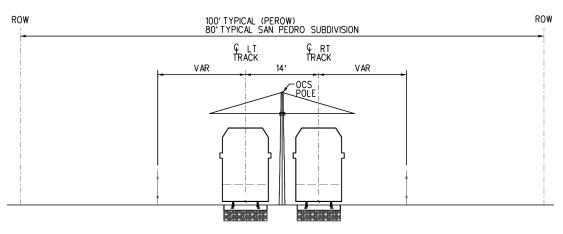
Typical Cross Section of an At-Grade Guideway with Embedded Track
